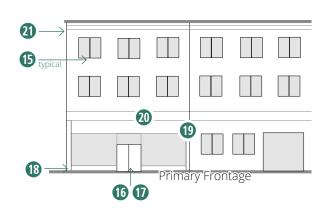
G-3. Workshop Building: Facade Design Requirements
